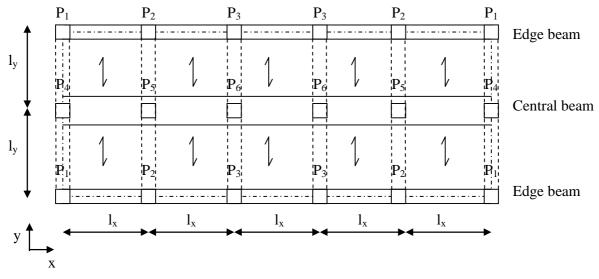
Plan view of the RC frame building assumed as representative of the building structural type for seismically designed buildings.
